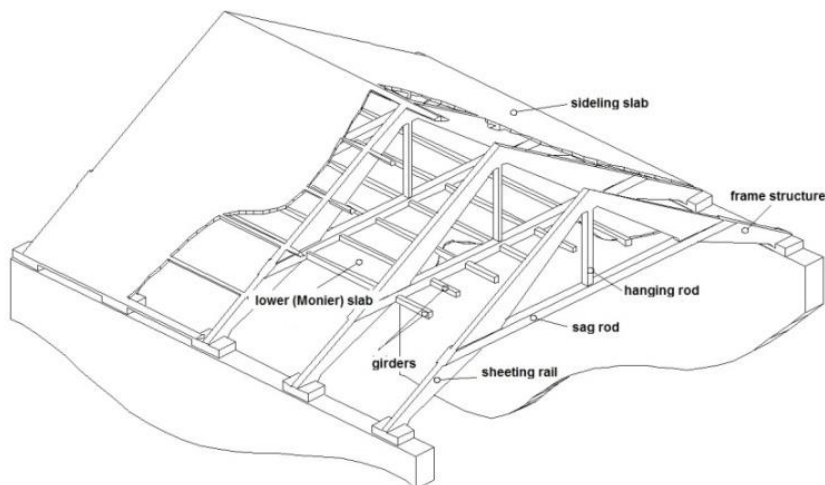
Spatial reinforced-concrete roof structure on the “Nationa Theatre – Népszínház” building, a masterpiece of Dr. Szilárd Zielinszky (author’s drawing)
